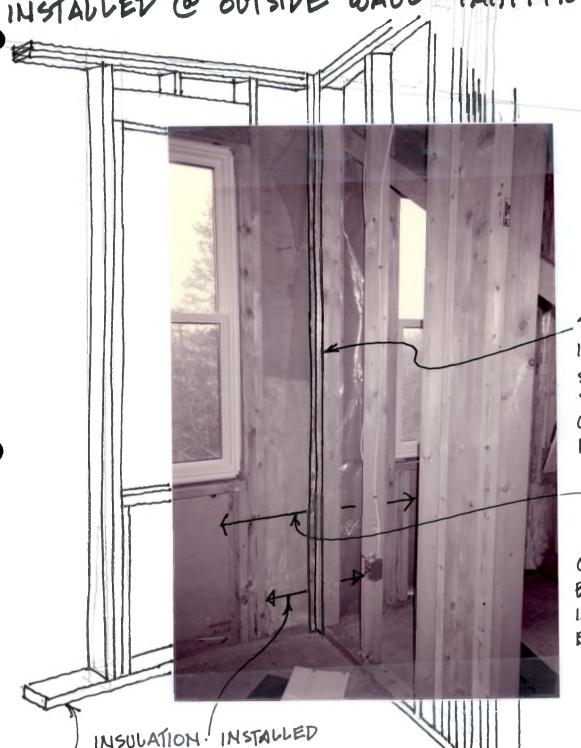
PHOTO DETAIL SHOWING "L" SECTION INSTALLED @ OUTSIDE WALL - PARTITION
